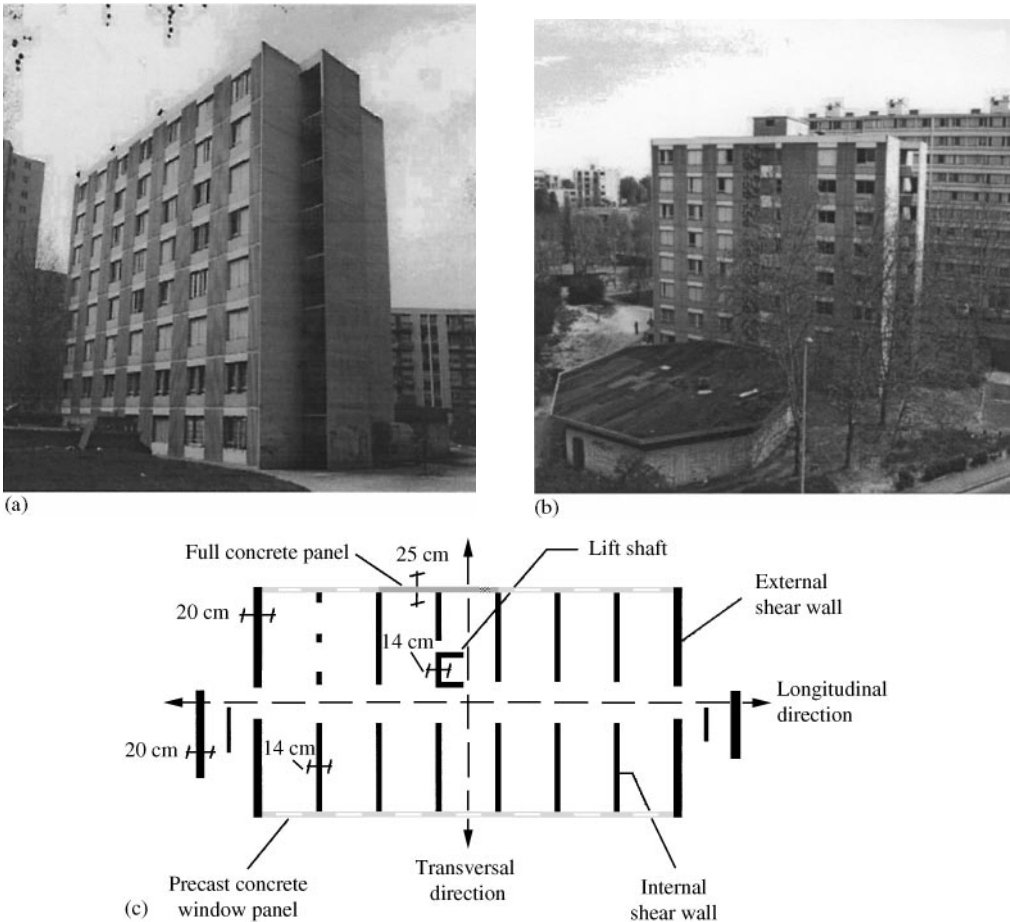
The tested seven-level building (1970). Height: 22 m. Length: 30 m. Width: 14 m. (a) South front. (b) North front. (c) Typical floor plan showing: Shear walls in concrete, internal: 0.14 m × 6 m × 2.55 m, external: 0.20 m × 6 m × 2.55 m. Precast concrete window panels, 0.20 m × 4 m × 2.55 m. Window: 2.10 m × 1.53 m. Two full concrete façade panels, 0.20 m × 4 m × 2.55 m. Lift shaft: 2 walls 0.14 m × 1.60 m × 2.55 m, 1 wall 0.14 m × 1.80 m × 2.55 m. Floors in reinforced concrete, thickness: 0.15 m.
